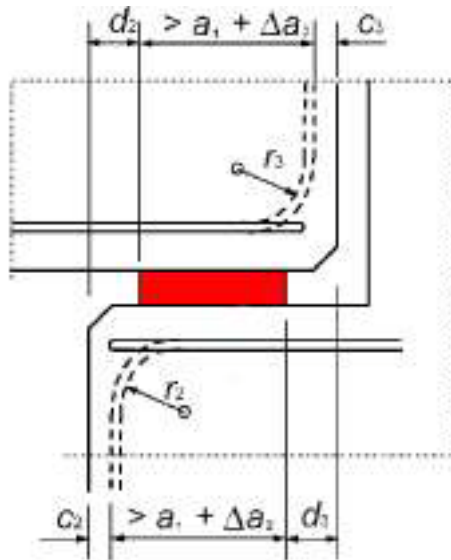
b Example of reinforcement detail on a support
